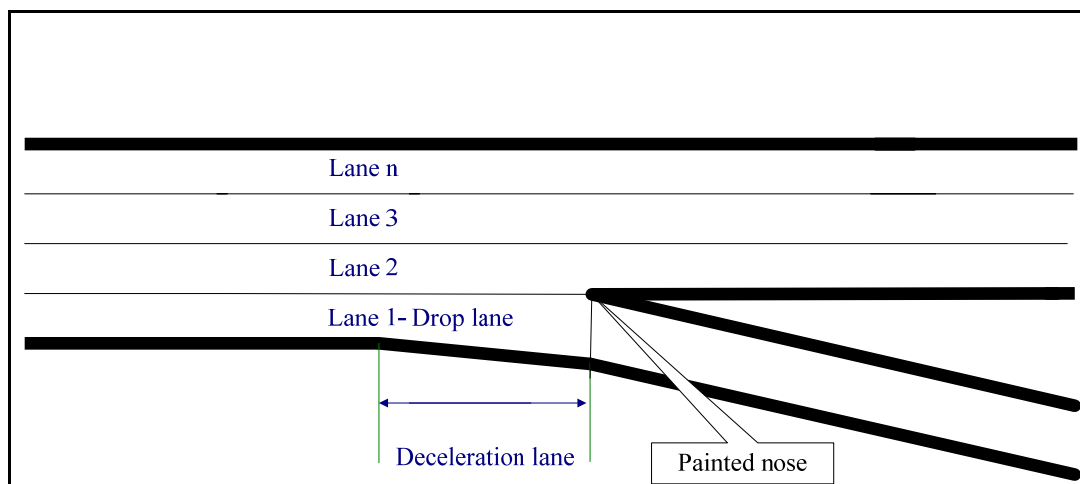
Type 2 Exit Ramp: Single-lane Exit Ramp without a Taper
